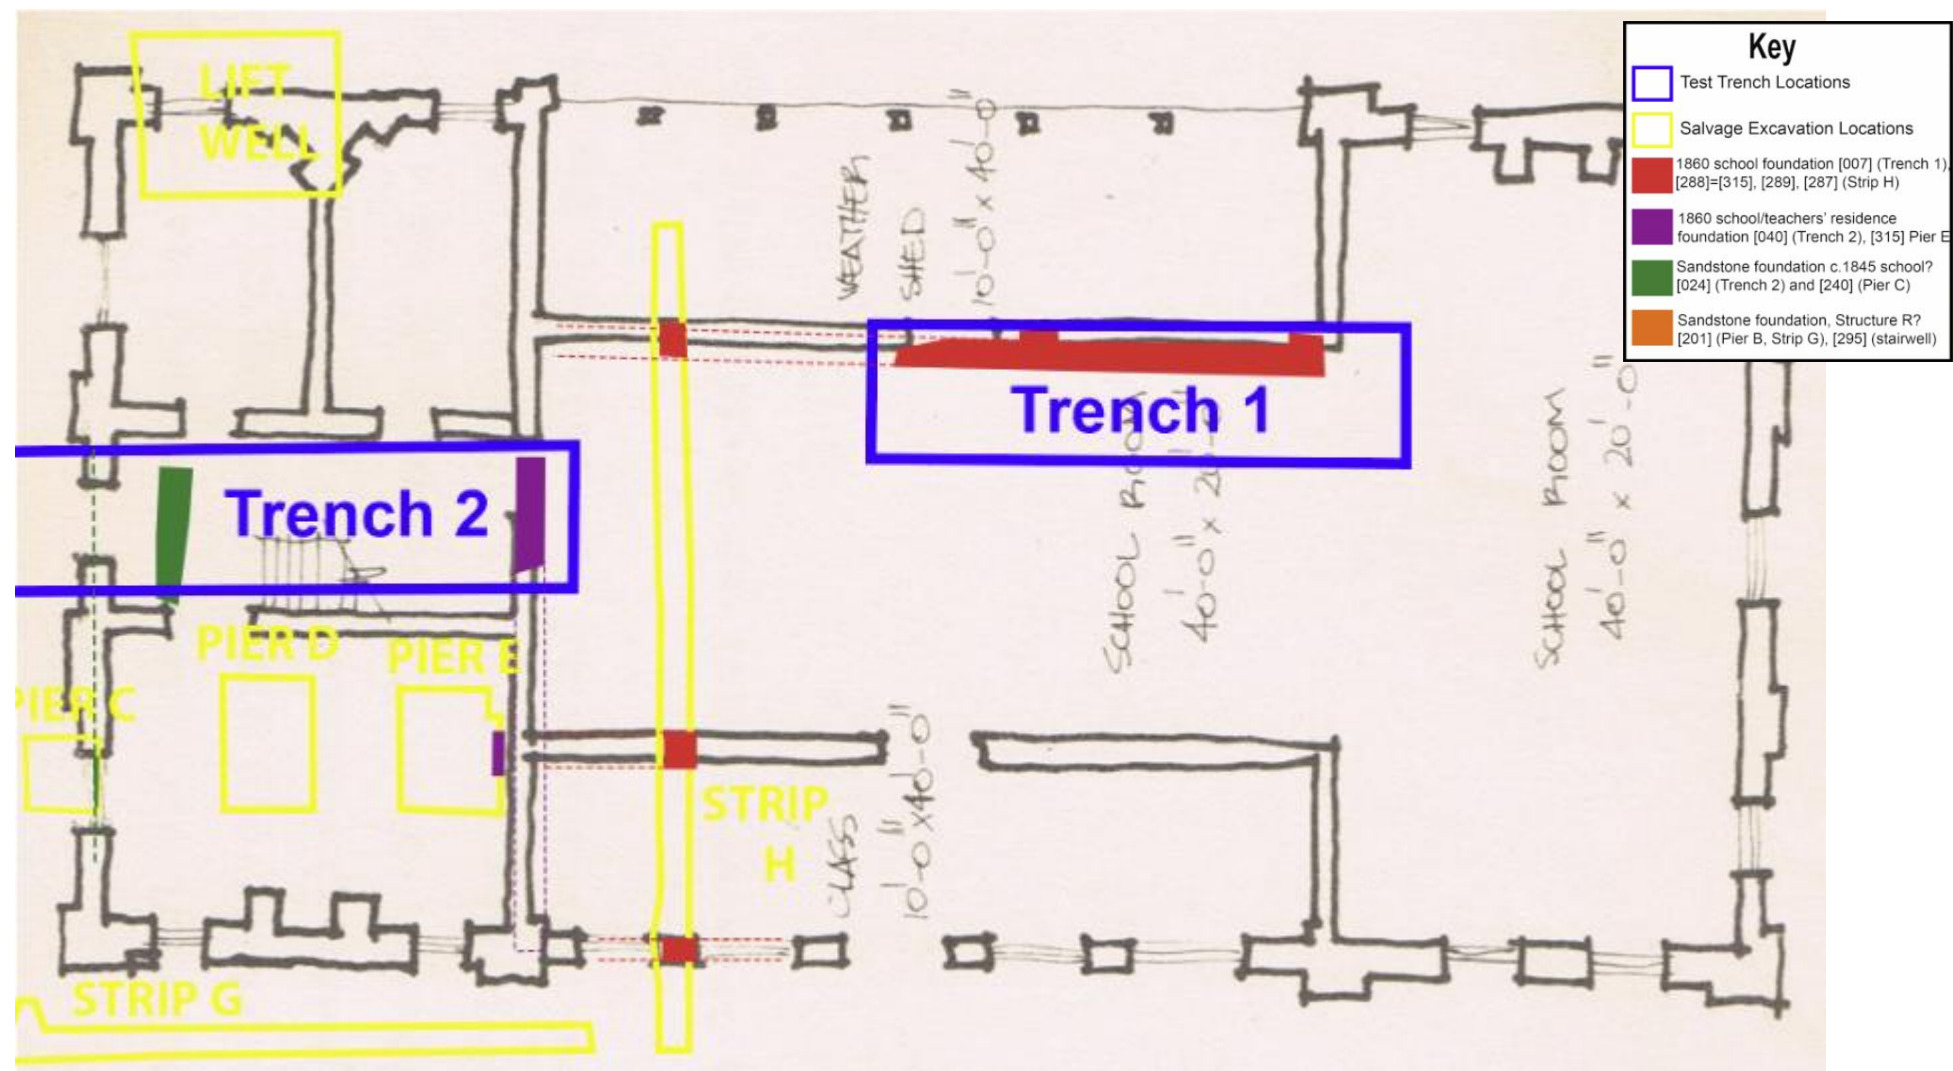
Overlay of Test and Salvage Excavation 1860 floorplan interpretation (Figure 2.9). Overlay by Vetta.
